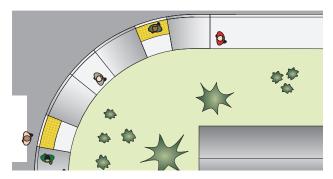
Ramp placement on narrow curb tight sidewalk
